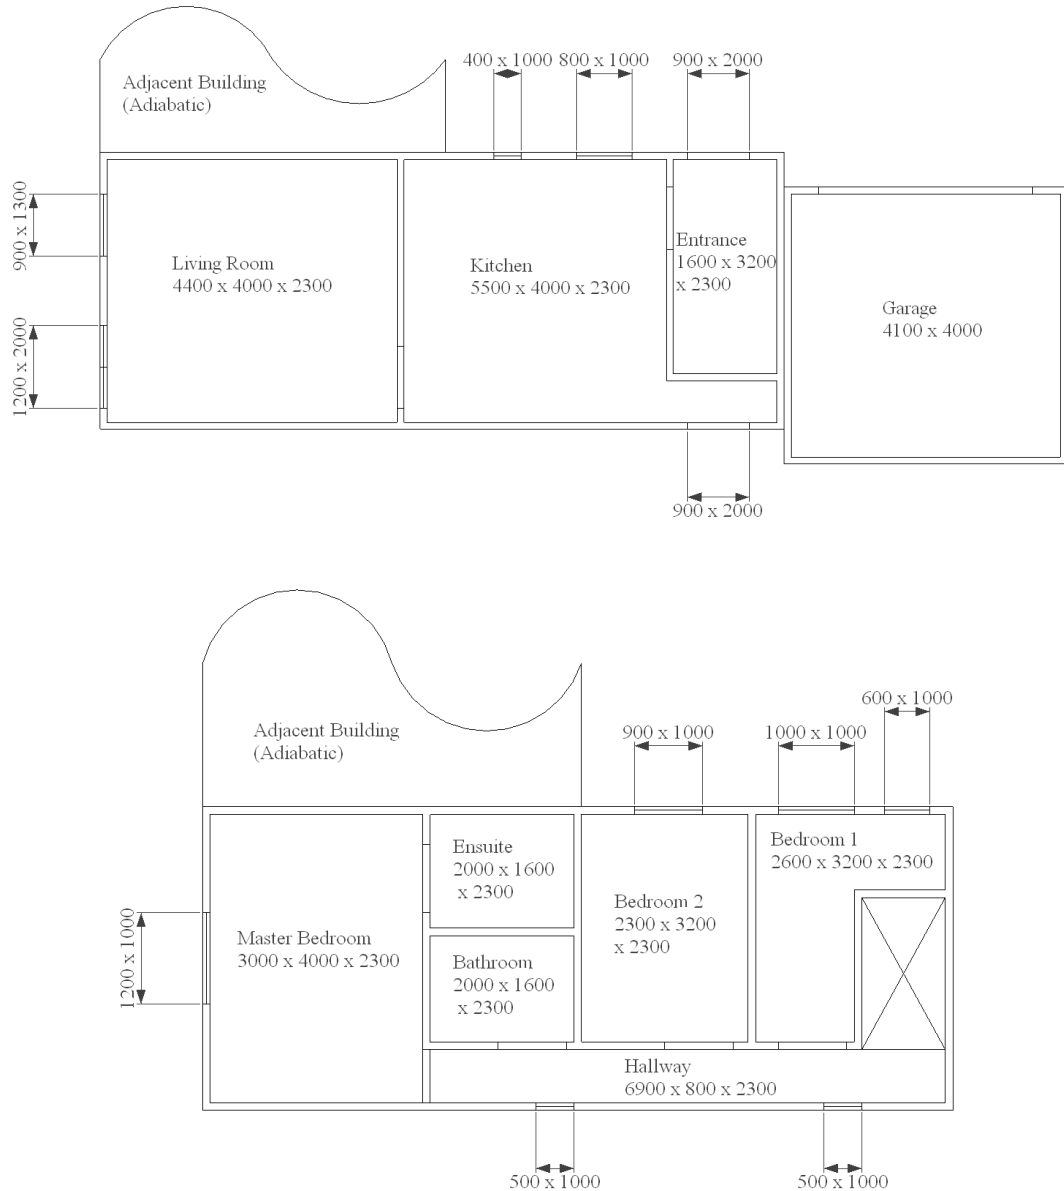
Ground floor and first floor plan for the temperature control building respectively.
